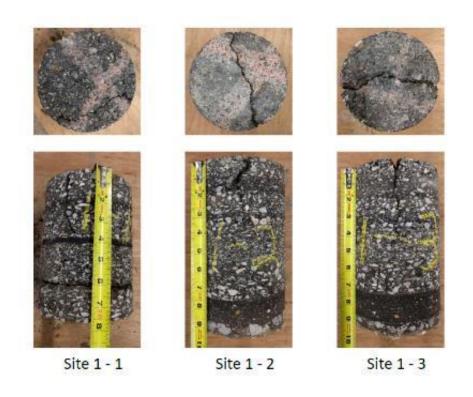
Photo. Three Cores from Site 1 (Collected in April 2016)
